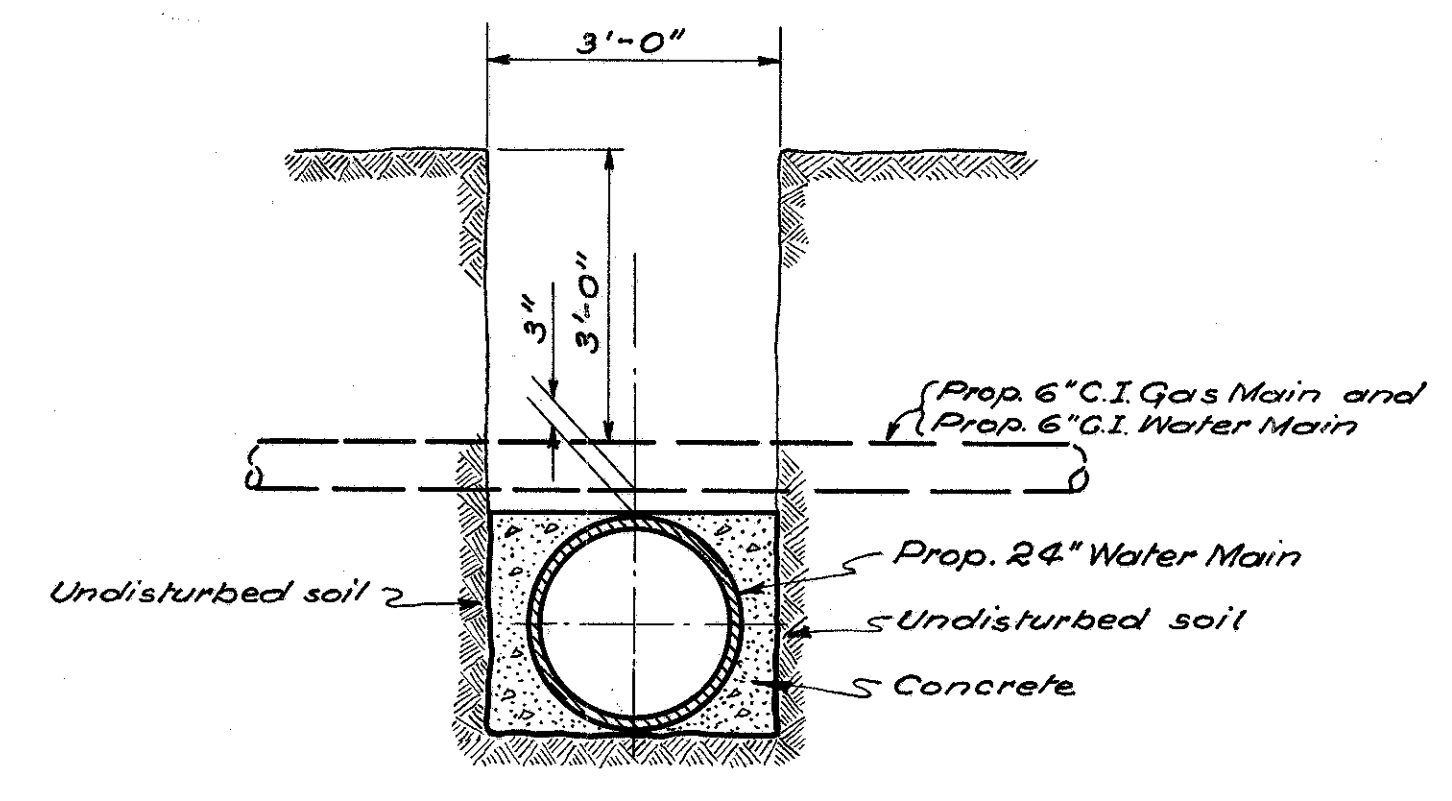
+83 LEFT CONNECTION TO EXISTING 24" WATER MAIN
